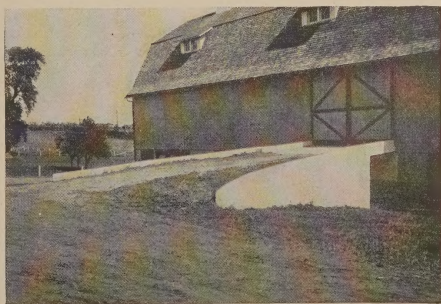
Concrete barn approach with self-supporting slab at doorway.
